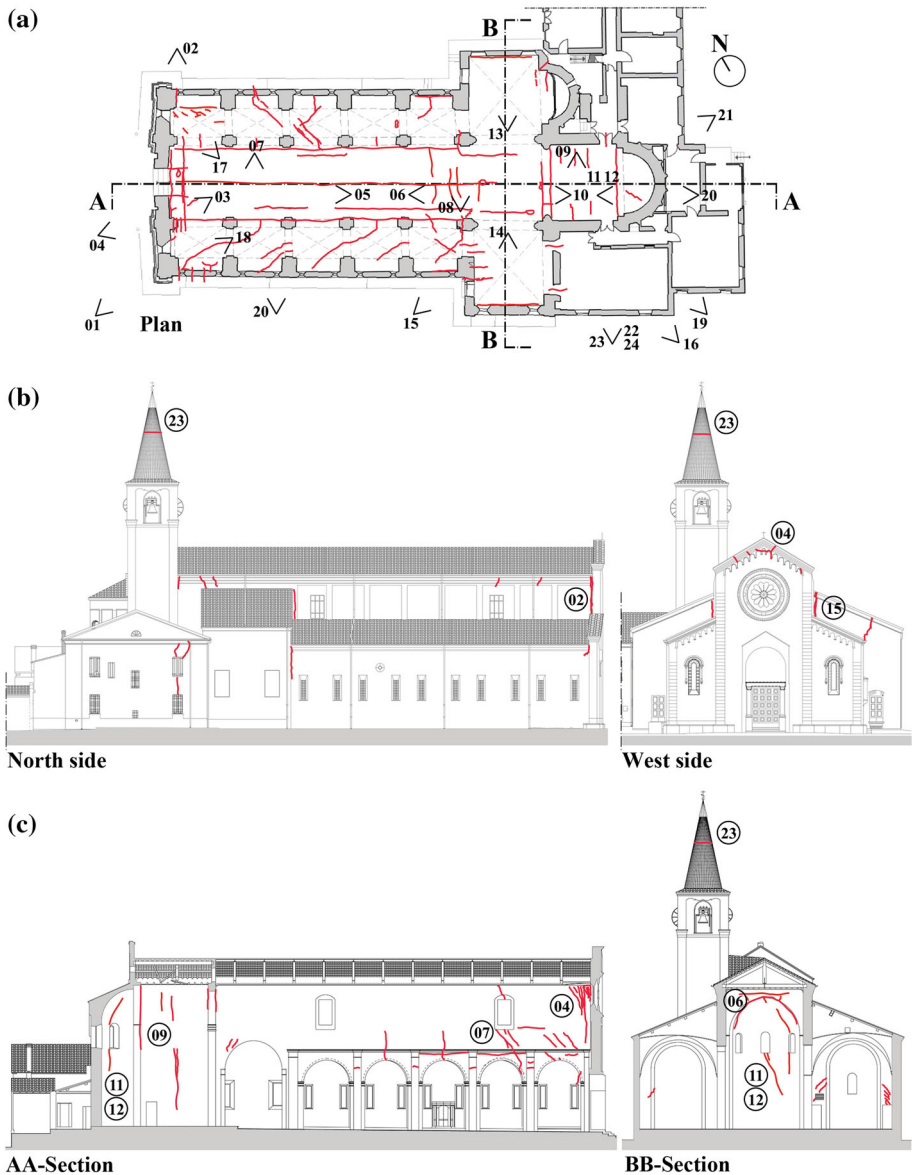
San Benedetto Abate church damage survey: crack pattern
